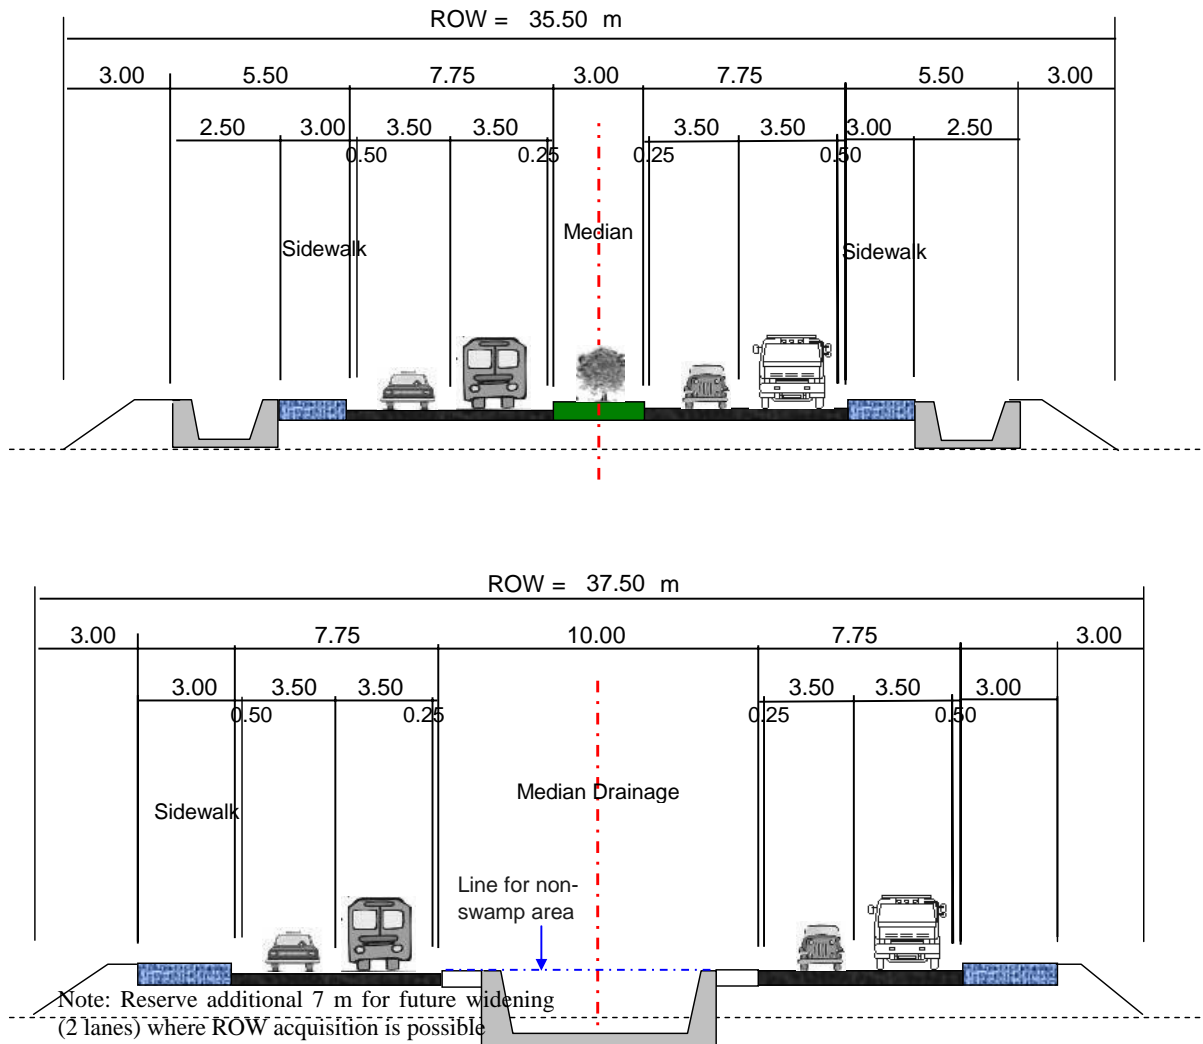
Typical Cross Section for Swamp Area (Types 1, 2 and 3)
